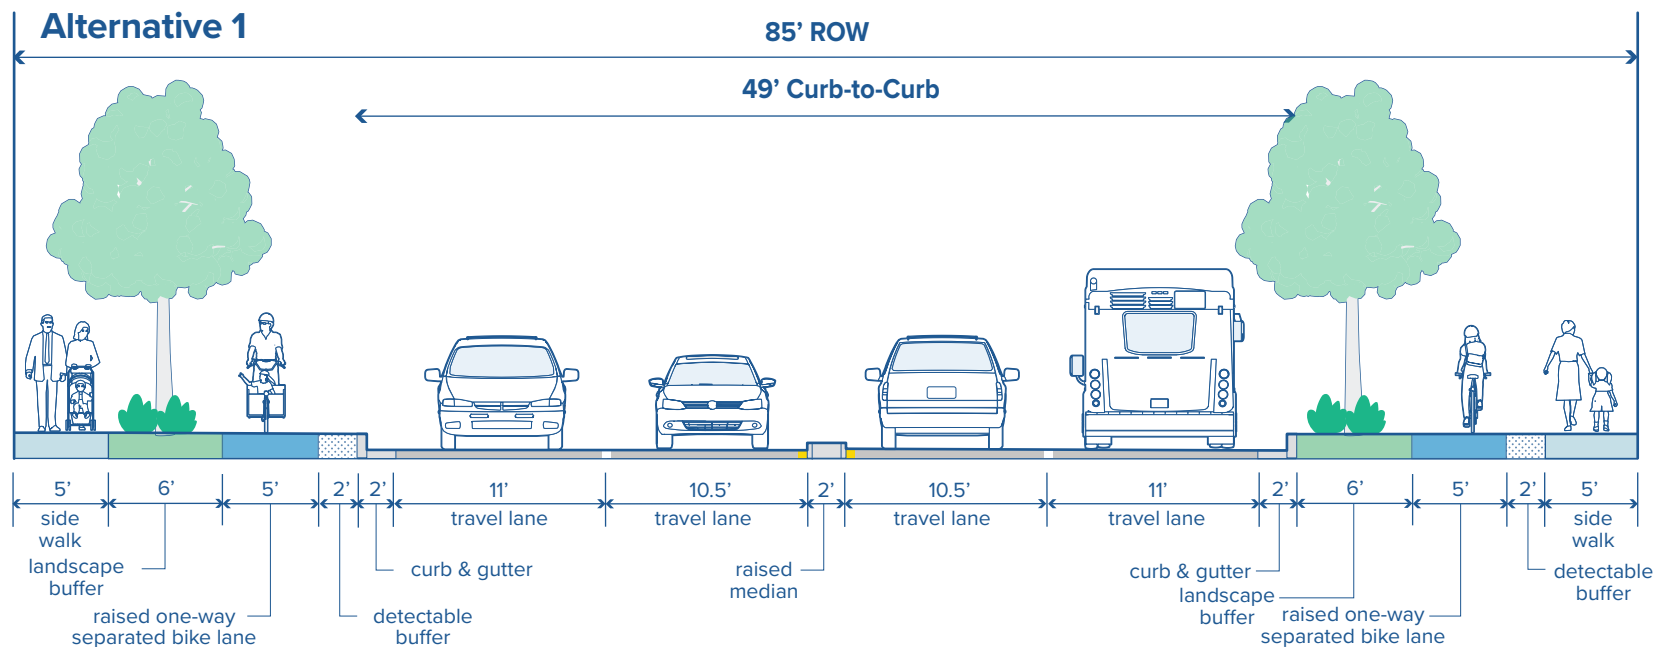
Alternative 1 Sidewalk-Level One-way Separated Bike Lanes (Consistent Landscaping)
